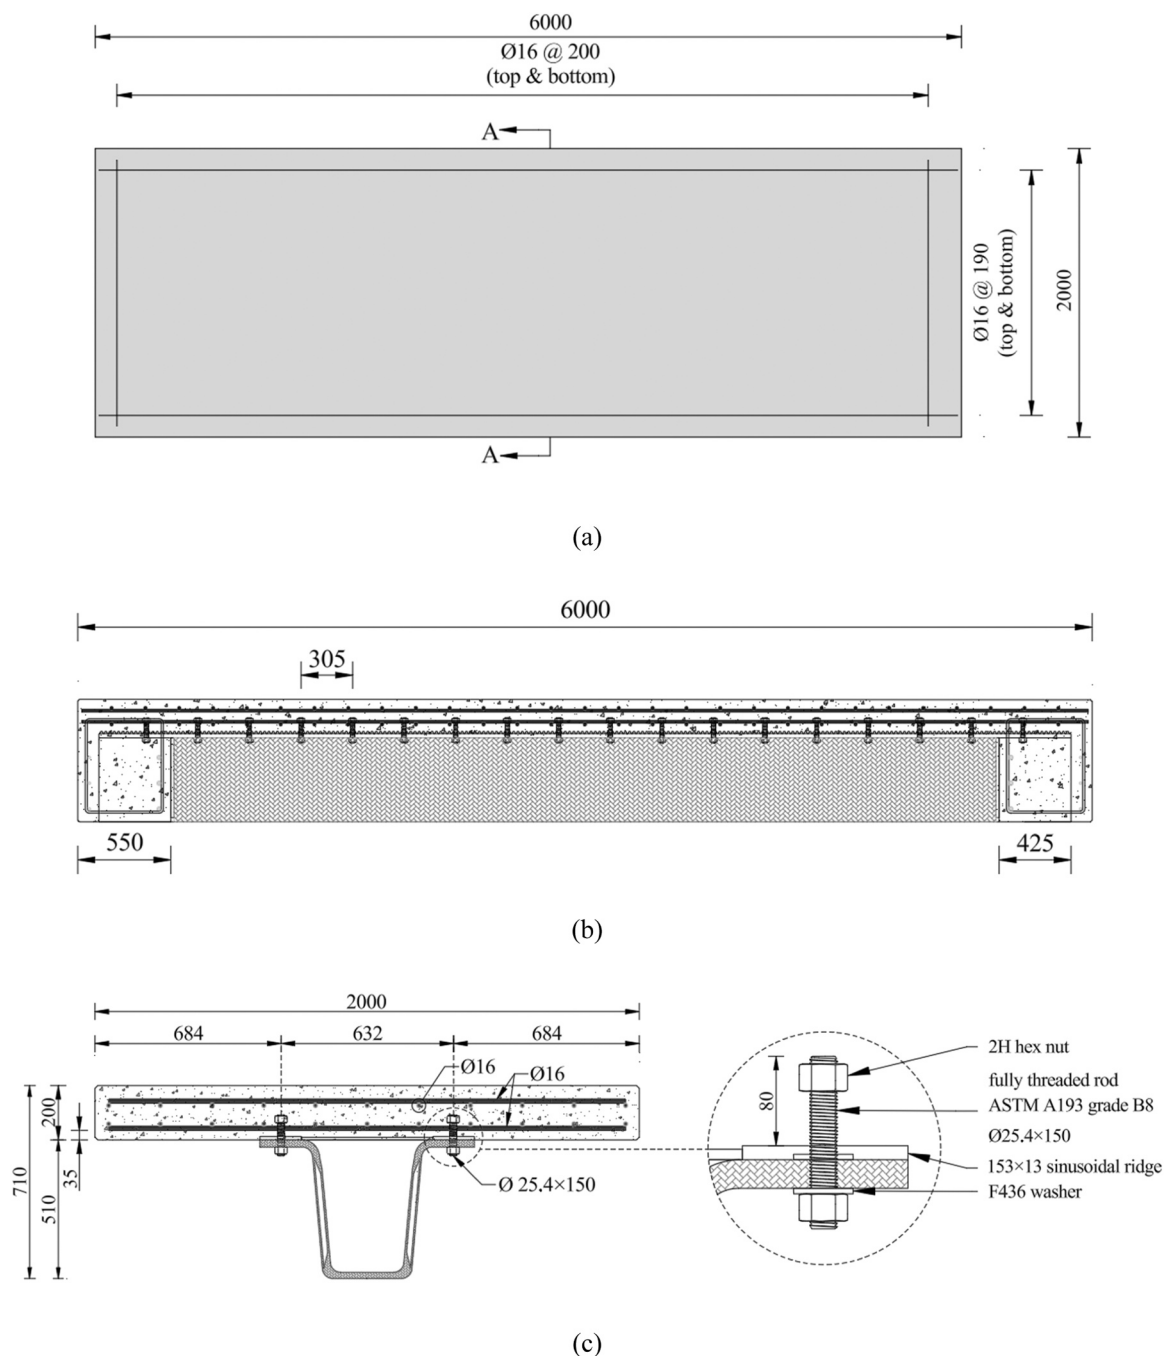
Geometric and reinforcement details of the FRP-concrete composite bridge deck specimen; (a) elevation view, (b) plan view and (c) section A-A (units: mm).
